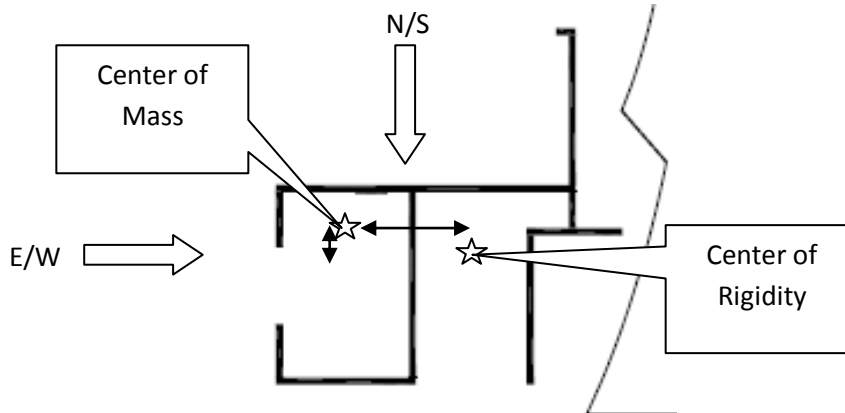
Floor plan showing general layout of the center of mass and center of rigidity
